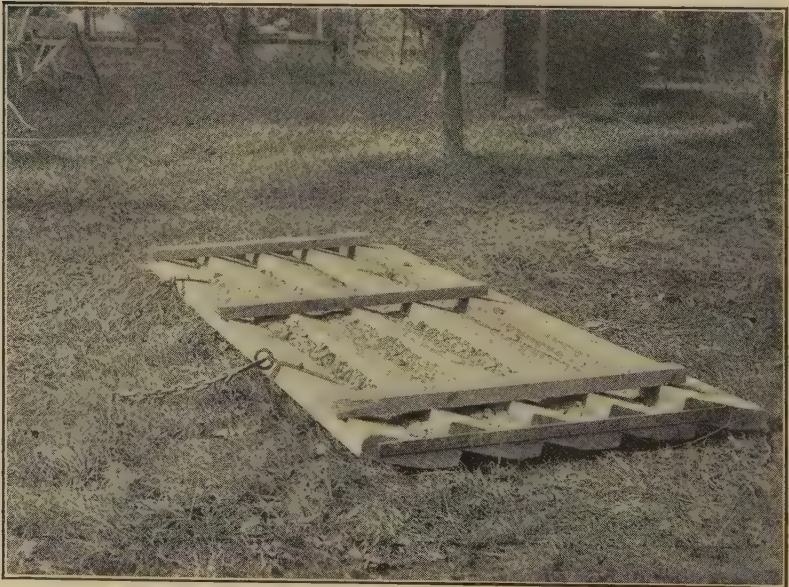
PLANK DRAG USED AT THE PENNSYLVANIA STATE COLLEGE
